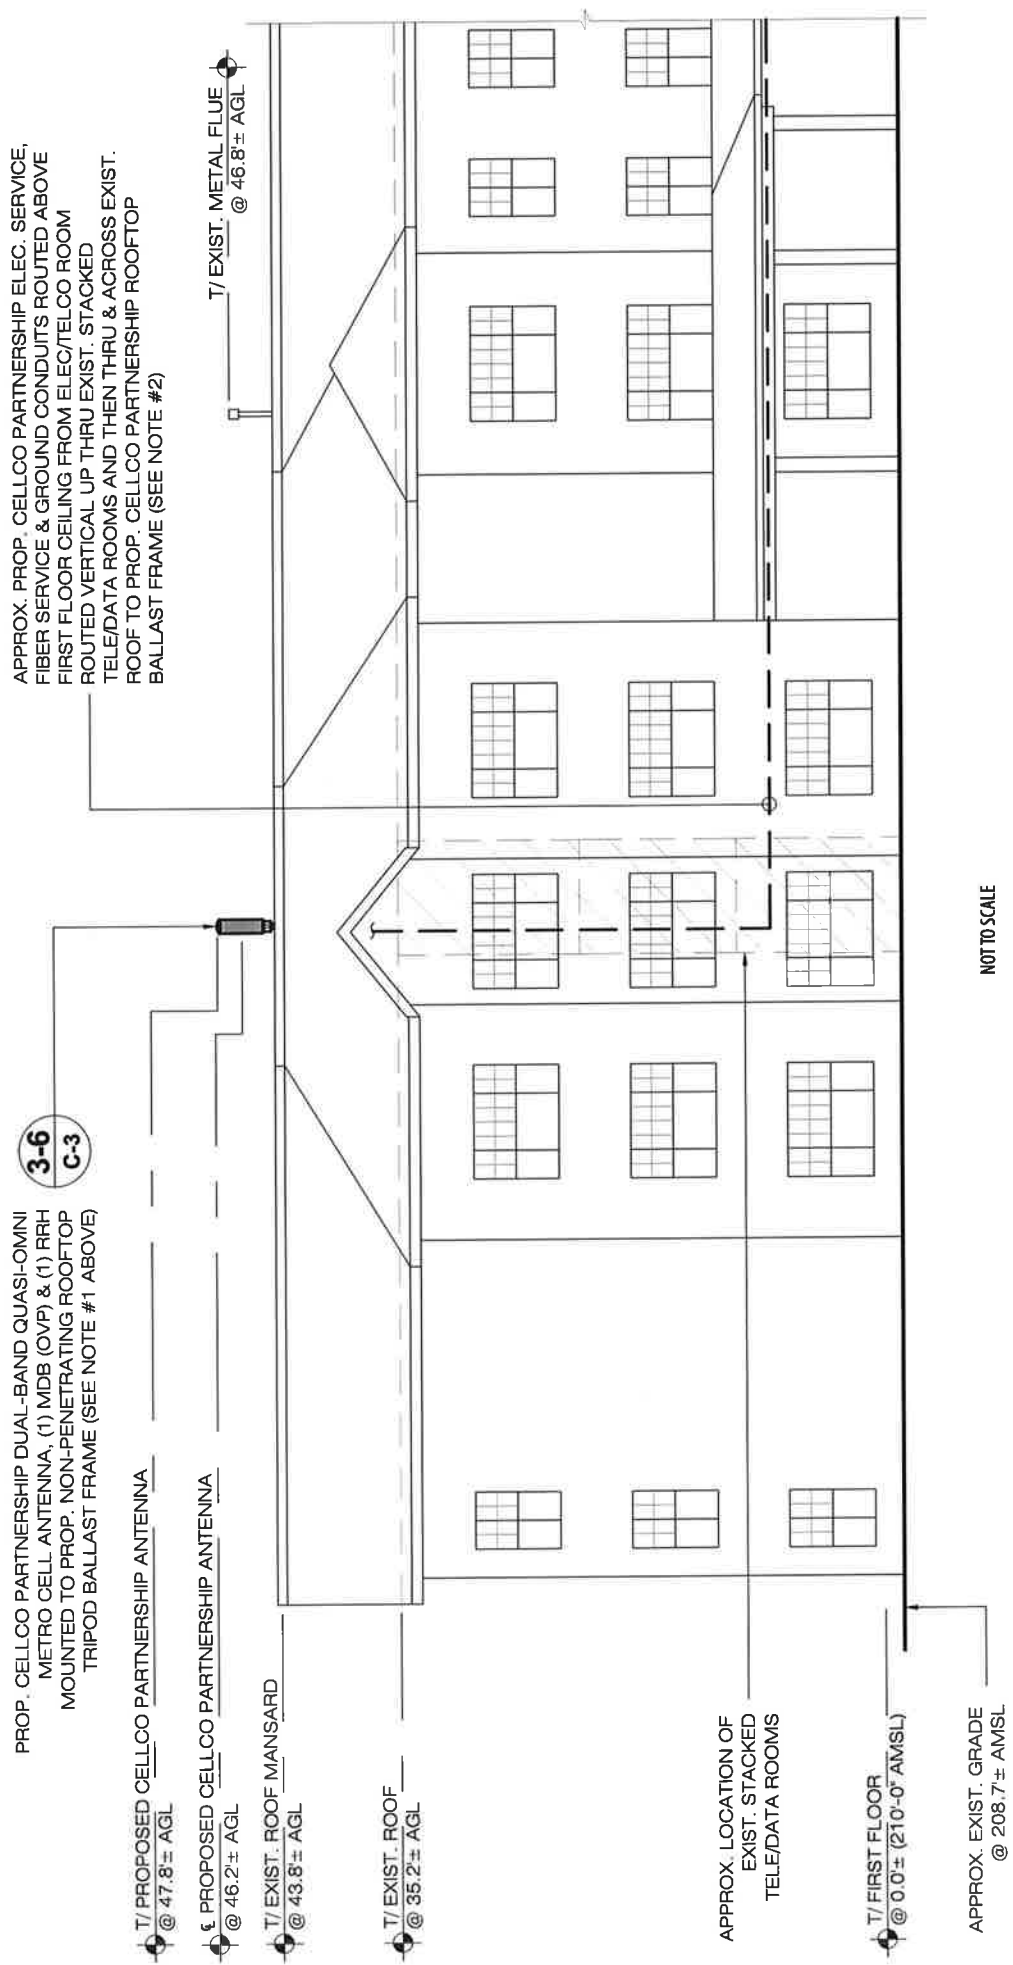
PROPOSED EQUIPMENT LOCATION AND ELEVATION PLAN
